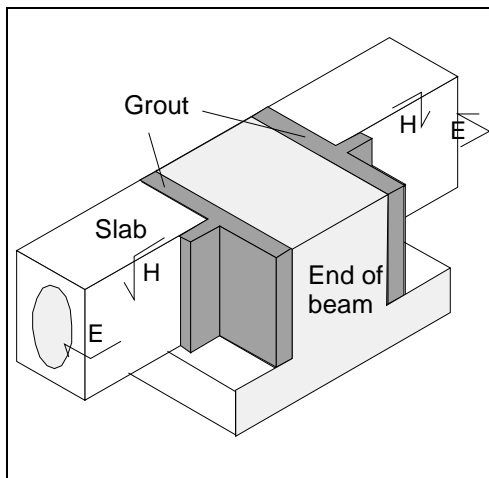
Cast-in-situ concrete (grout) outside hollow core slabs.
